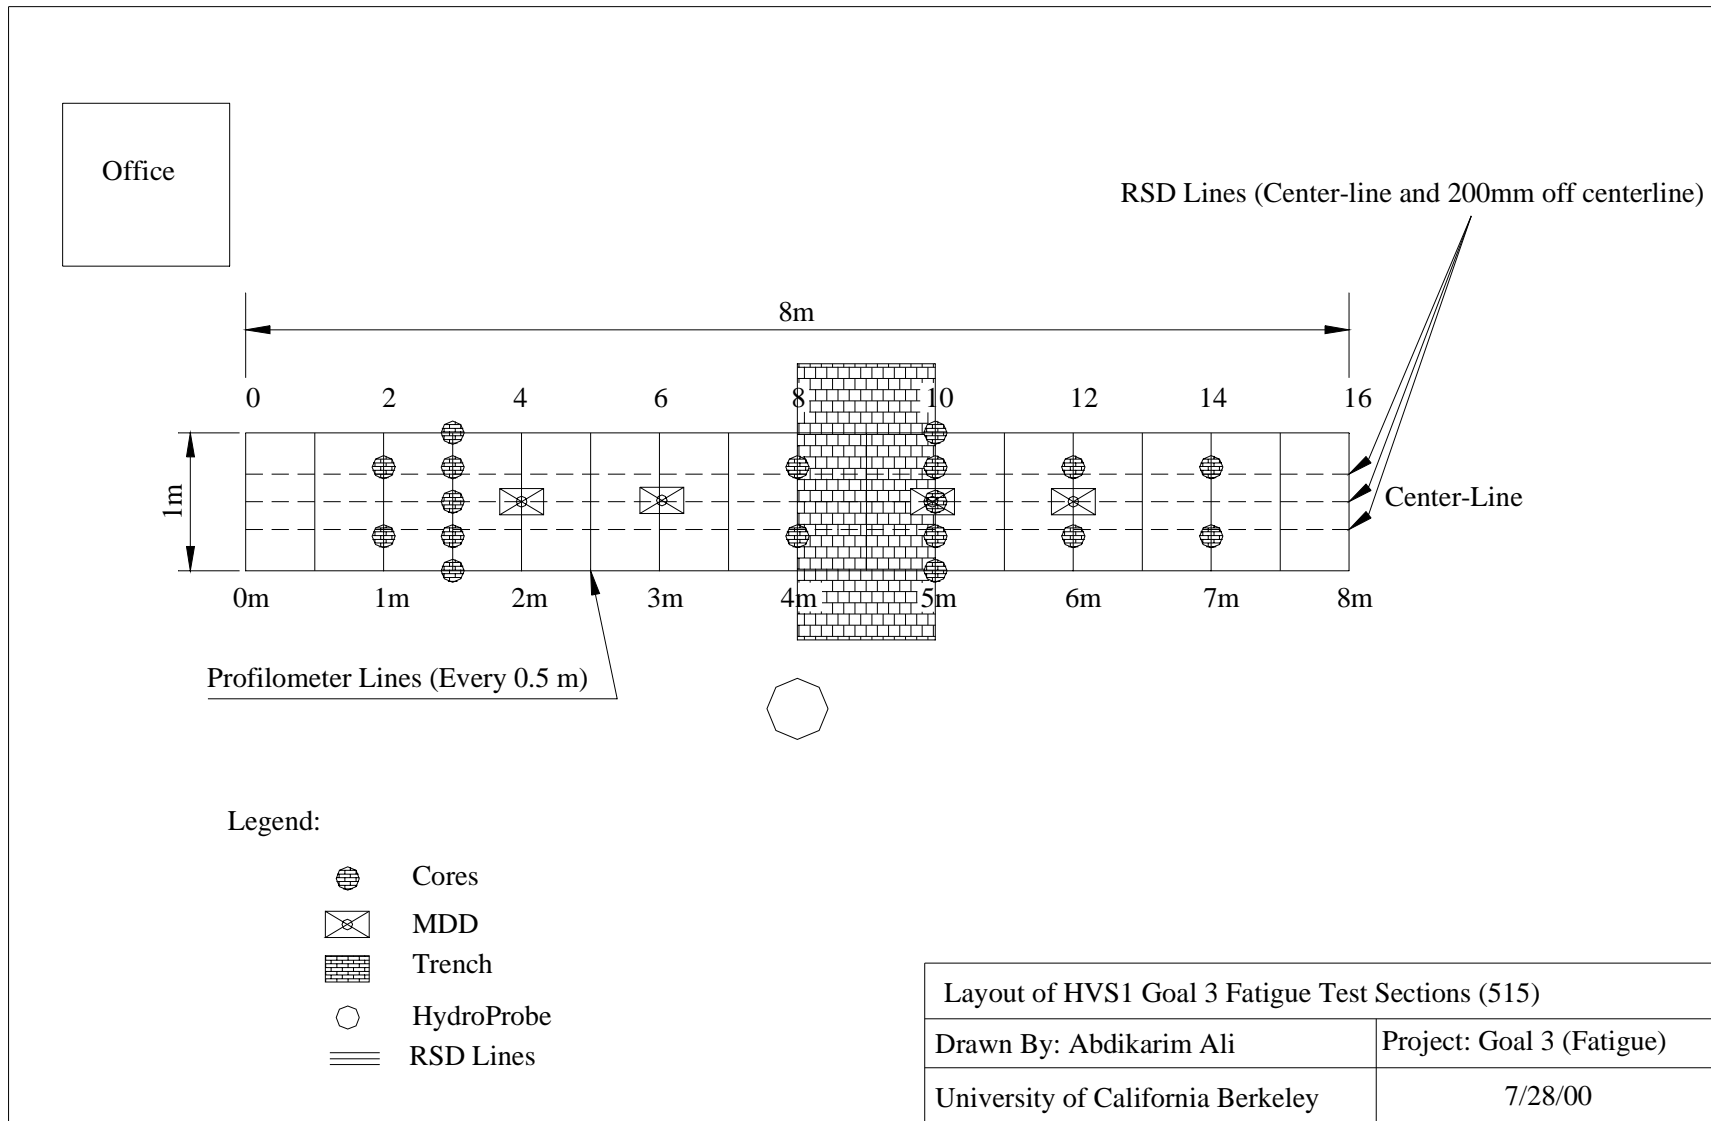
Locations of instrumentation, data collection points, and trenches and cores on Section 515 (drained, ARHM-GG overlay).
